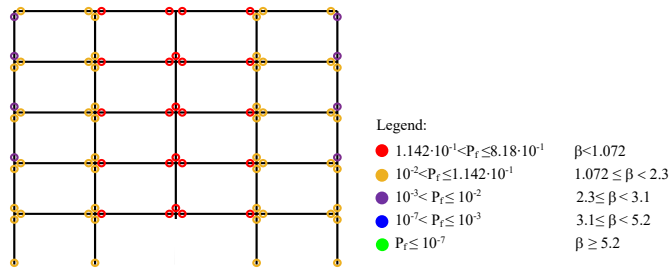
Maximum probability of failure between concrete and steel reinforcement.
